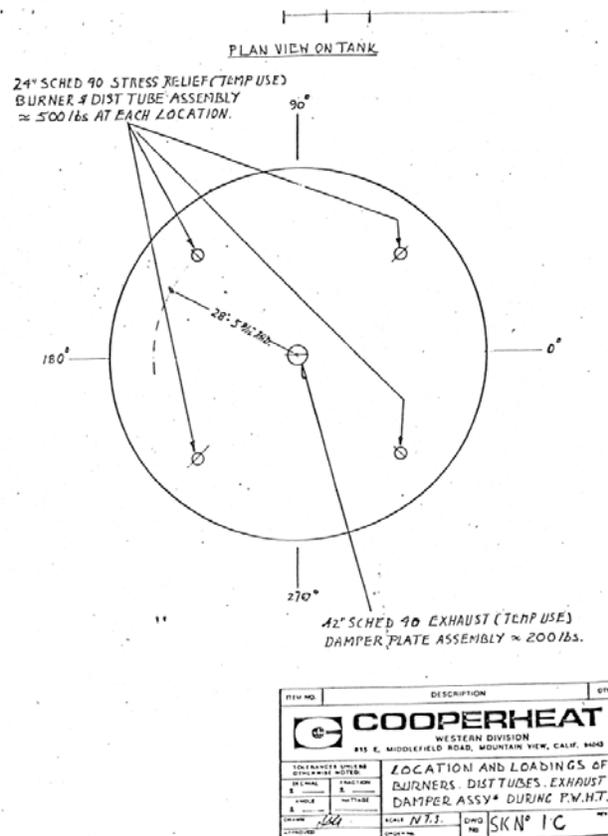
241-AP Post Weld Stress Relief Burner Layout
